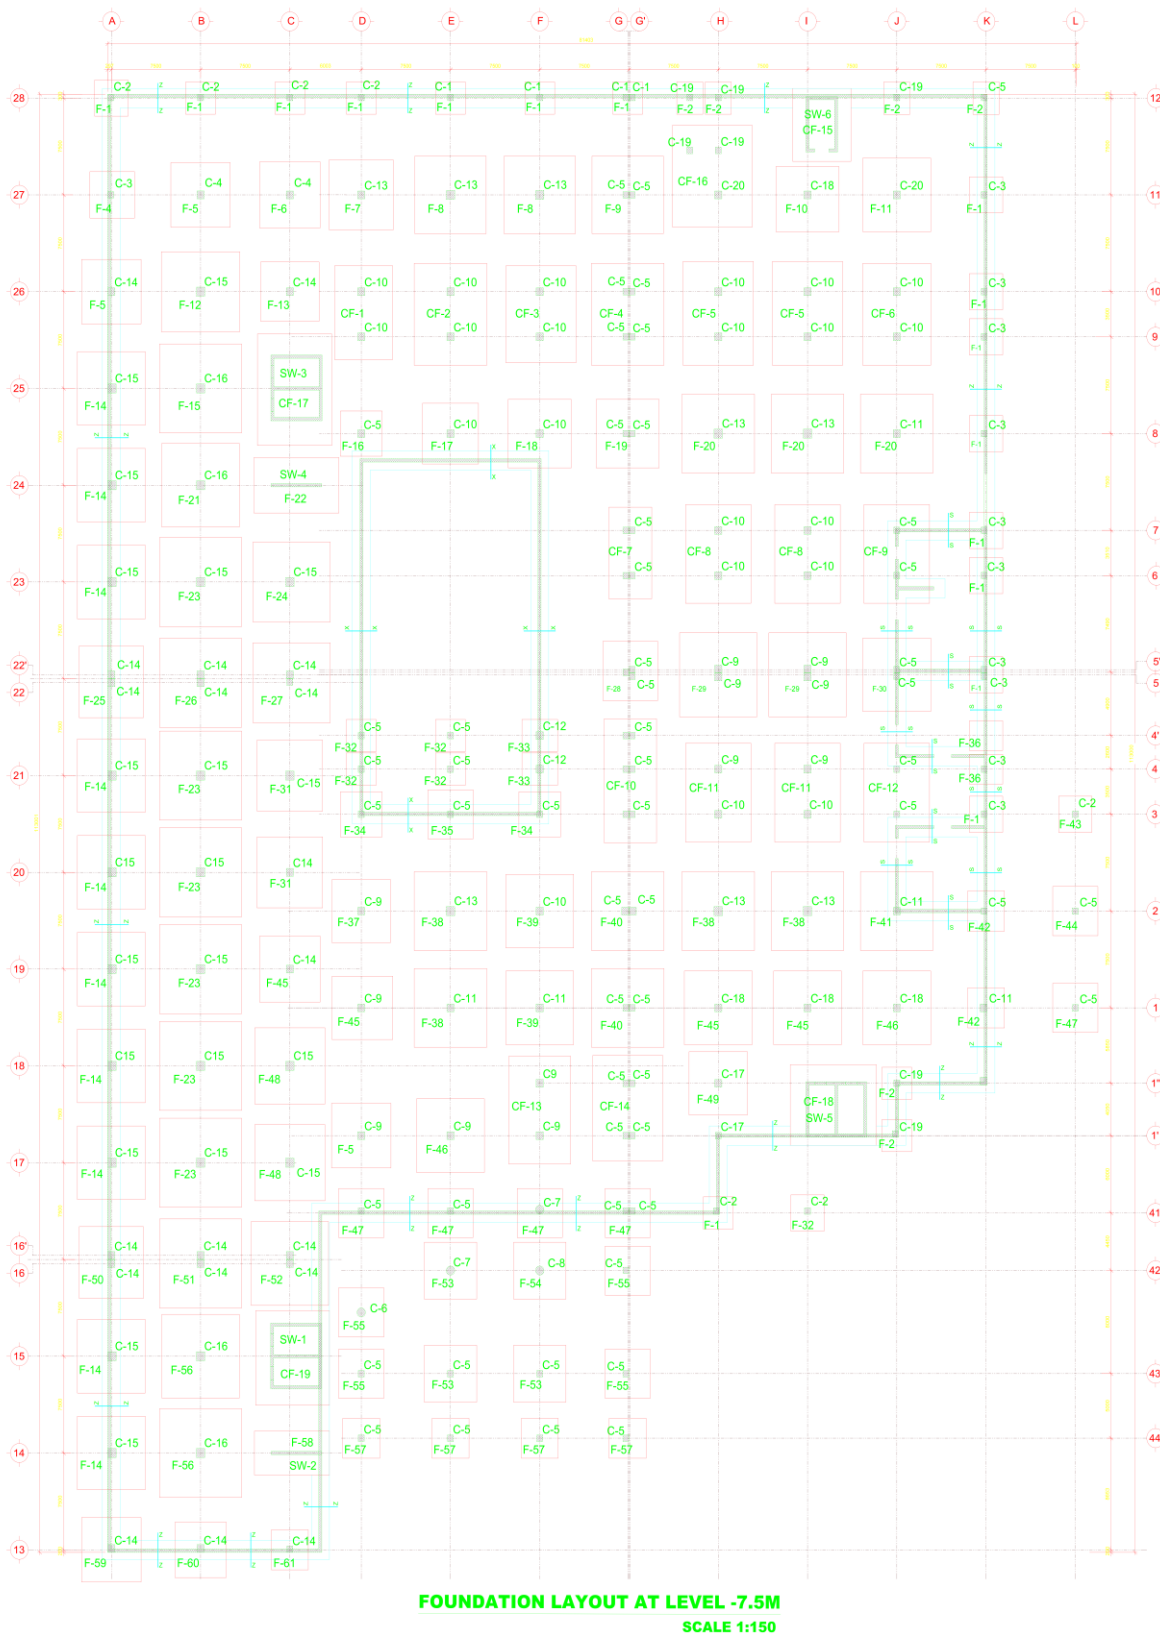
Figure: Appendix.0.3 MHB Foundation layout at -7.5m below the ground level
